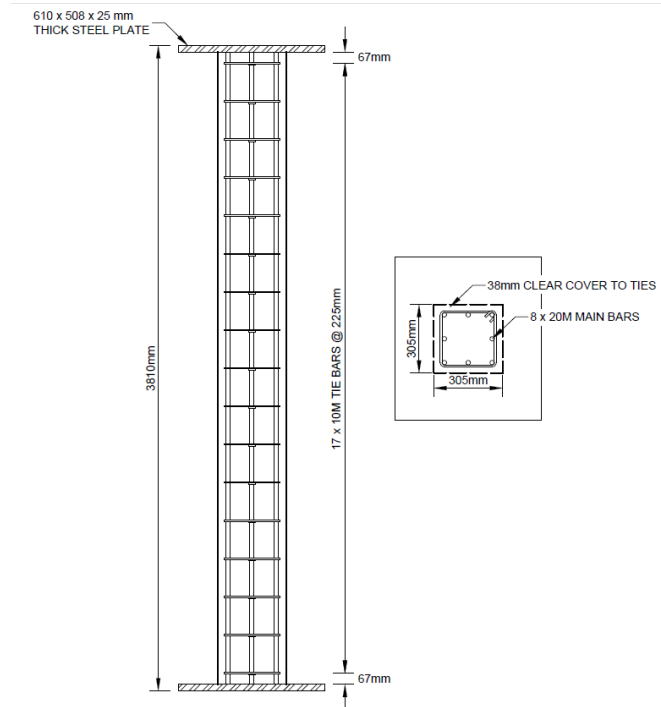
Details of the Reinforcement for the Column Specimen.
